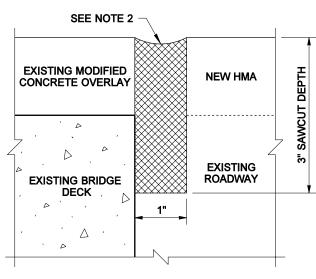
1/2" JOINT SEAL BRIDGE DECK WITH HMA OVERLAY
